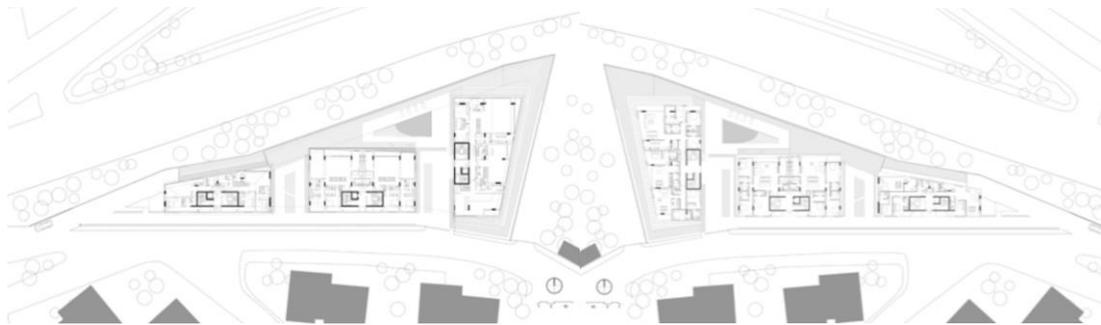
Ground and 1. Floor Plan of Qent İstinye Residence (URL-1).
